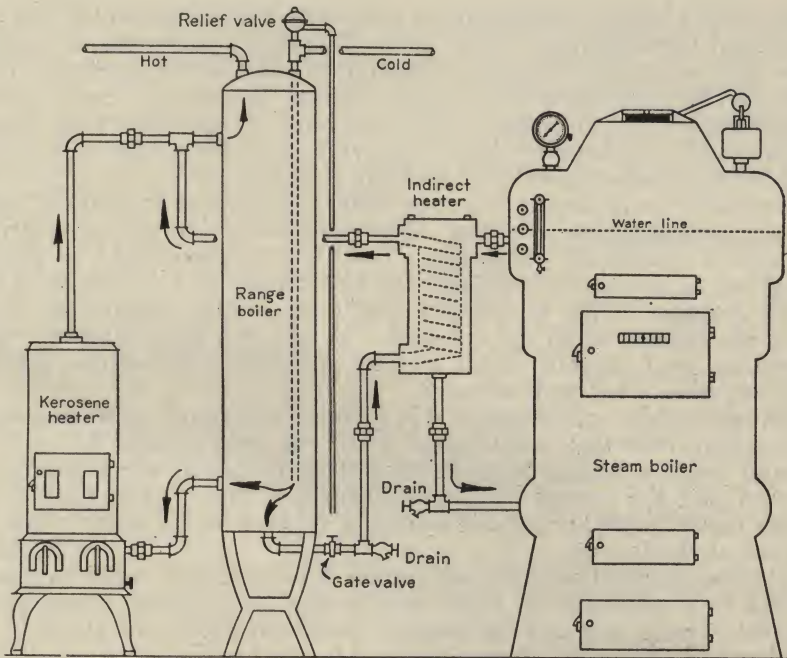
Steam-heating boiler connected to circulate boiler water through an indirect heater, inducing circulation in a range boiler; the kerosene heater connected directly to the range boiler is for summer or emergency use.
